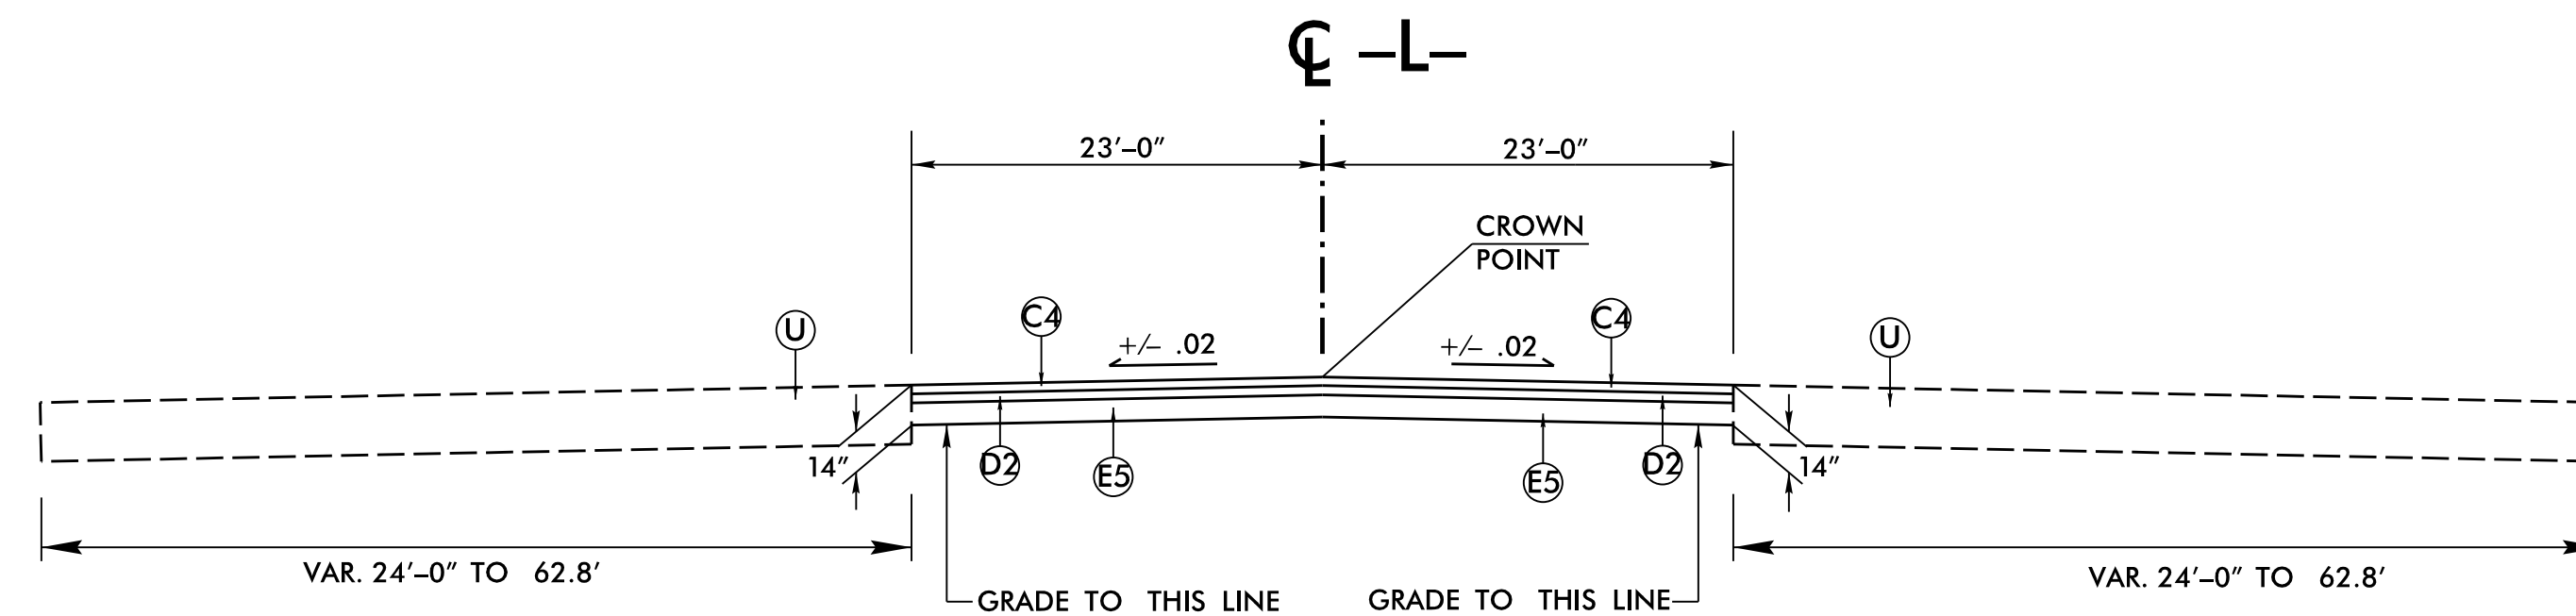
DETAIL SHOWING AGGREGATE SUBGRADE FOR SHALLOW UNDERCUT IN CURB AND GUTTER SECTIONS
